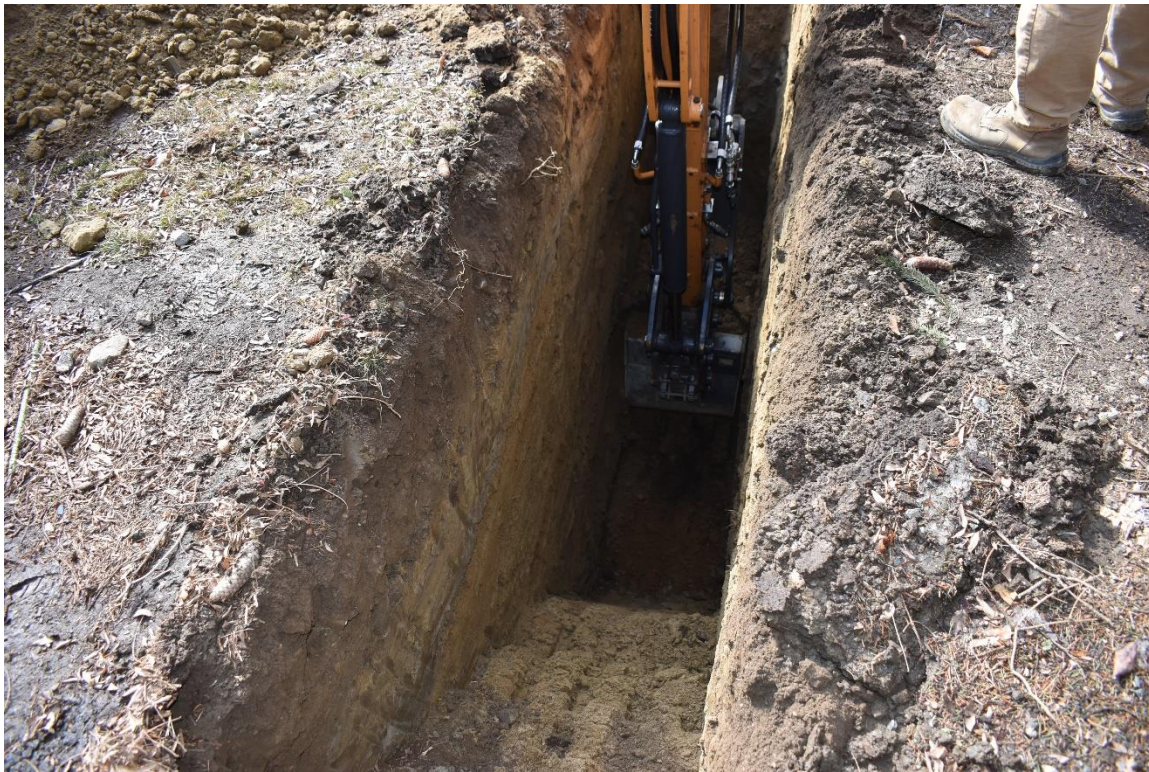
Trenches extended to a minimum of 8' below grade. View of Trench 3b.
